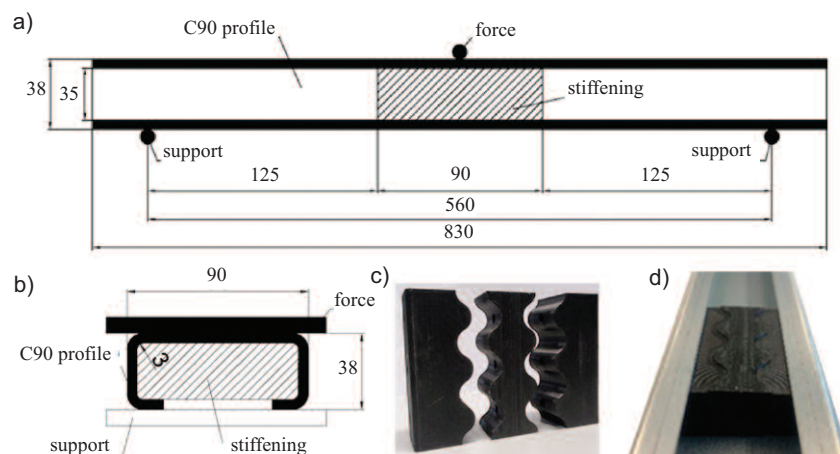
Tested beams: a) longitudinal section of the beam; b) cross-section of the beam – dimensions in mm; c) the stiffening element; d) the stiffening element embedded in the profile
